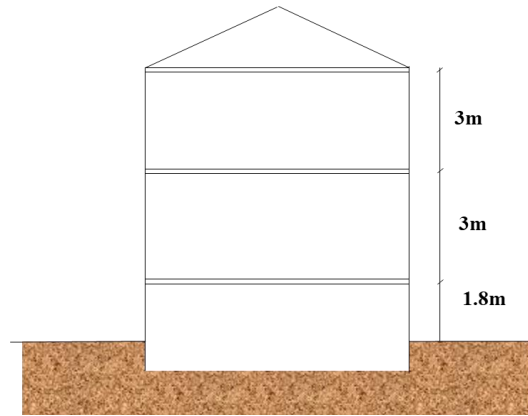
Schematic for two storey house with 1.8m subfloor above grade
